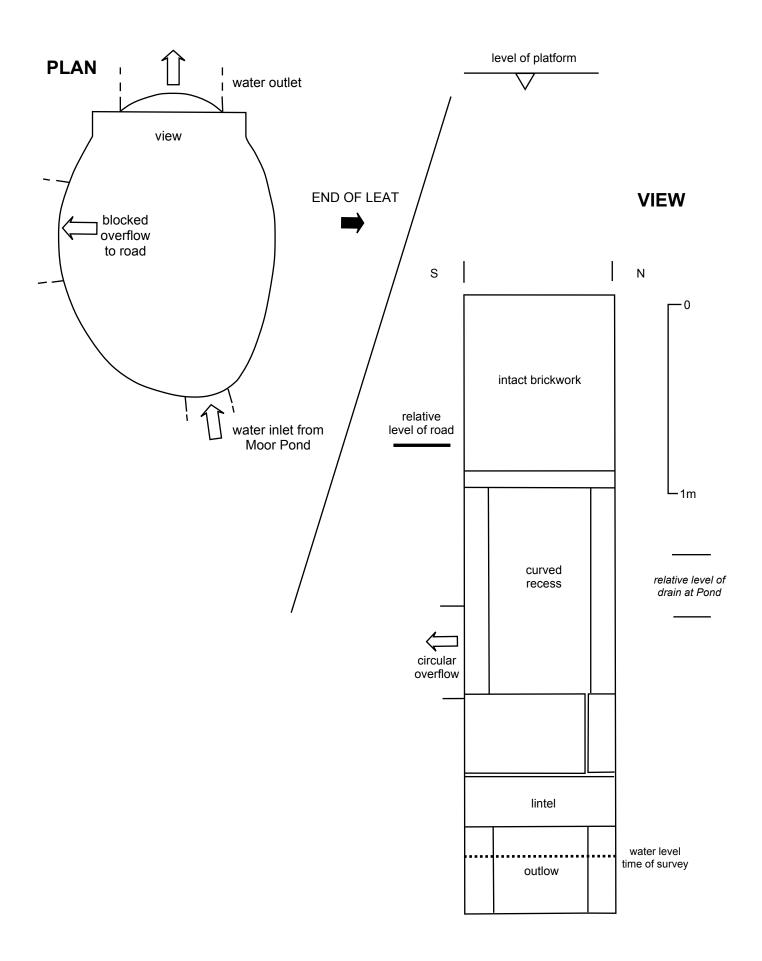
Stylistic plan and west end view of the egg-shaped shaft to the south-west of Moor Pond, Papplewick (close to Papplewick Lane). Scale 1:20.
